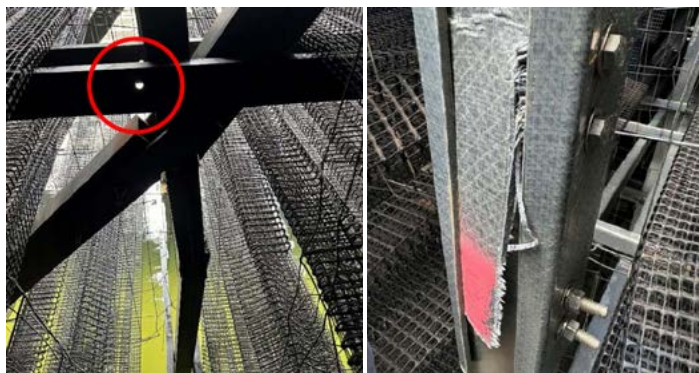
Failed Column Member & Missing Connection Hardware (left), Compression Failure (right).
